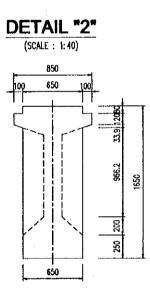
DETAIL OF SUPERSTRUCTURE FOR RAMPWAY 'D" BRIDGE (Ls = 27.3M)
